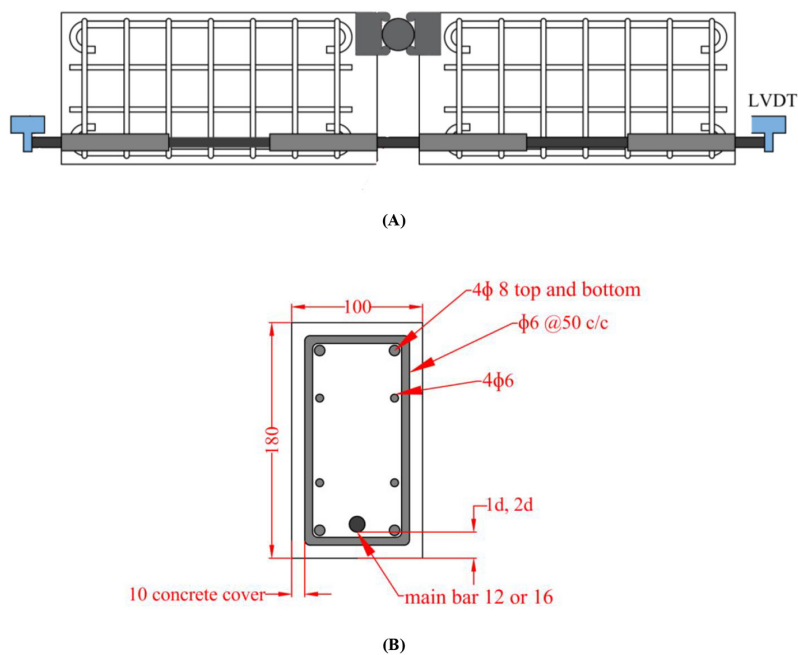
Reinforcing details of the specimen: (A) side view, (B) cross section
